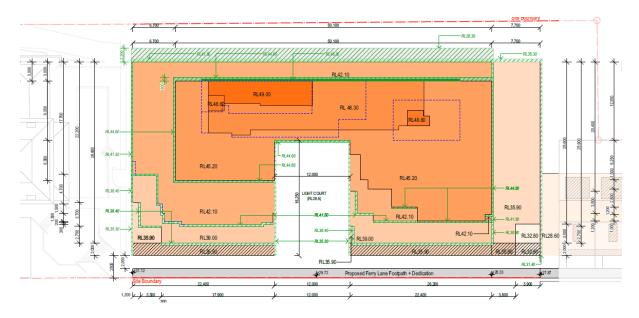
Proposed envelope detail/setbacks: residential flat building (green areas indicate articulation zone)
